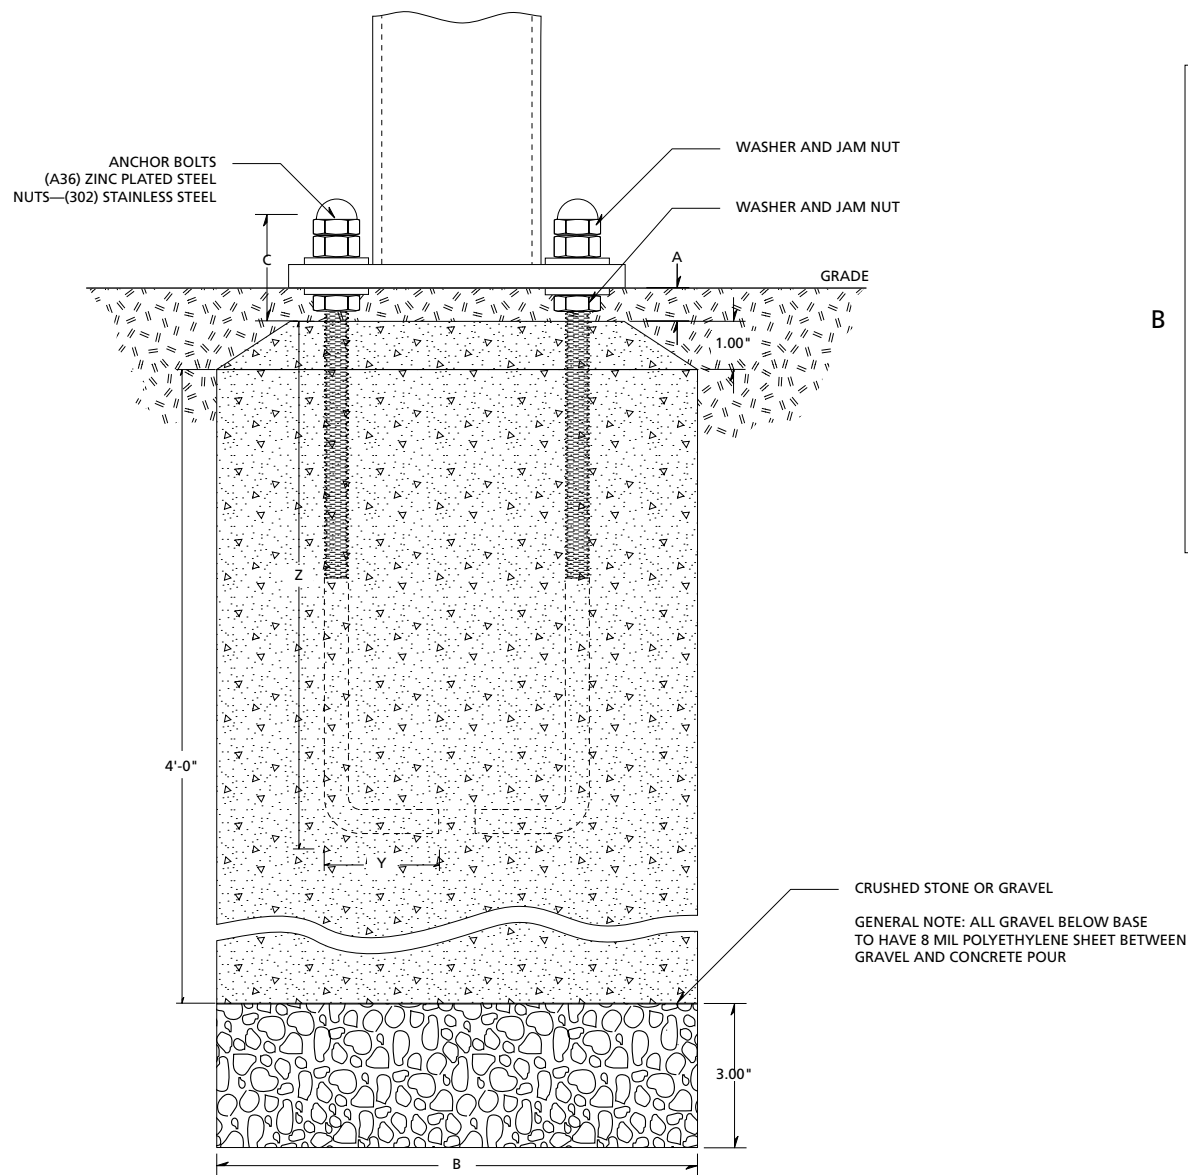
X 6 x 1/4" / 8" x 6" x 5/16" AND BASEPLATE ASSEMBLY SIDE ELEVATION
